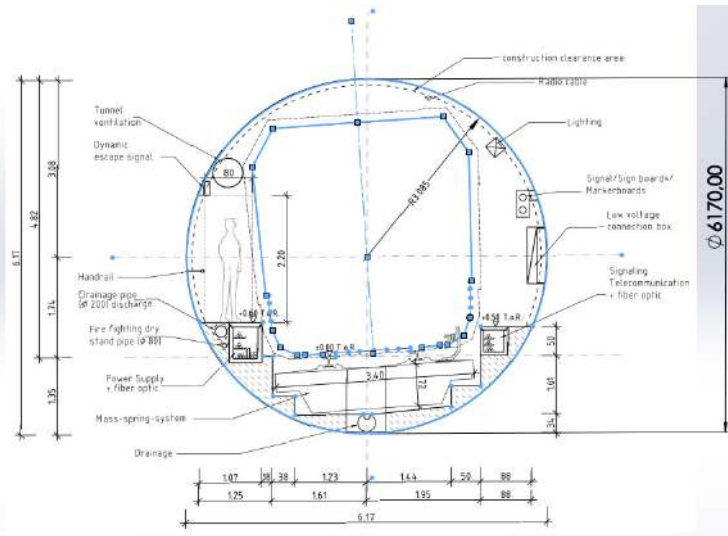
The Technical Drawing and the Projection Details of the Pilot Line [4]
